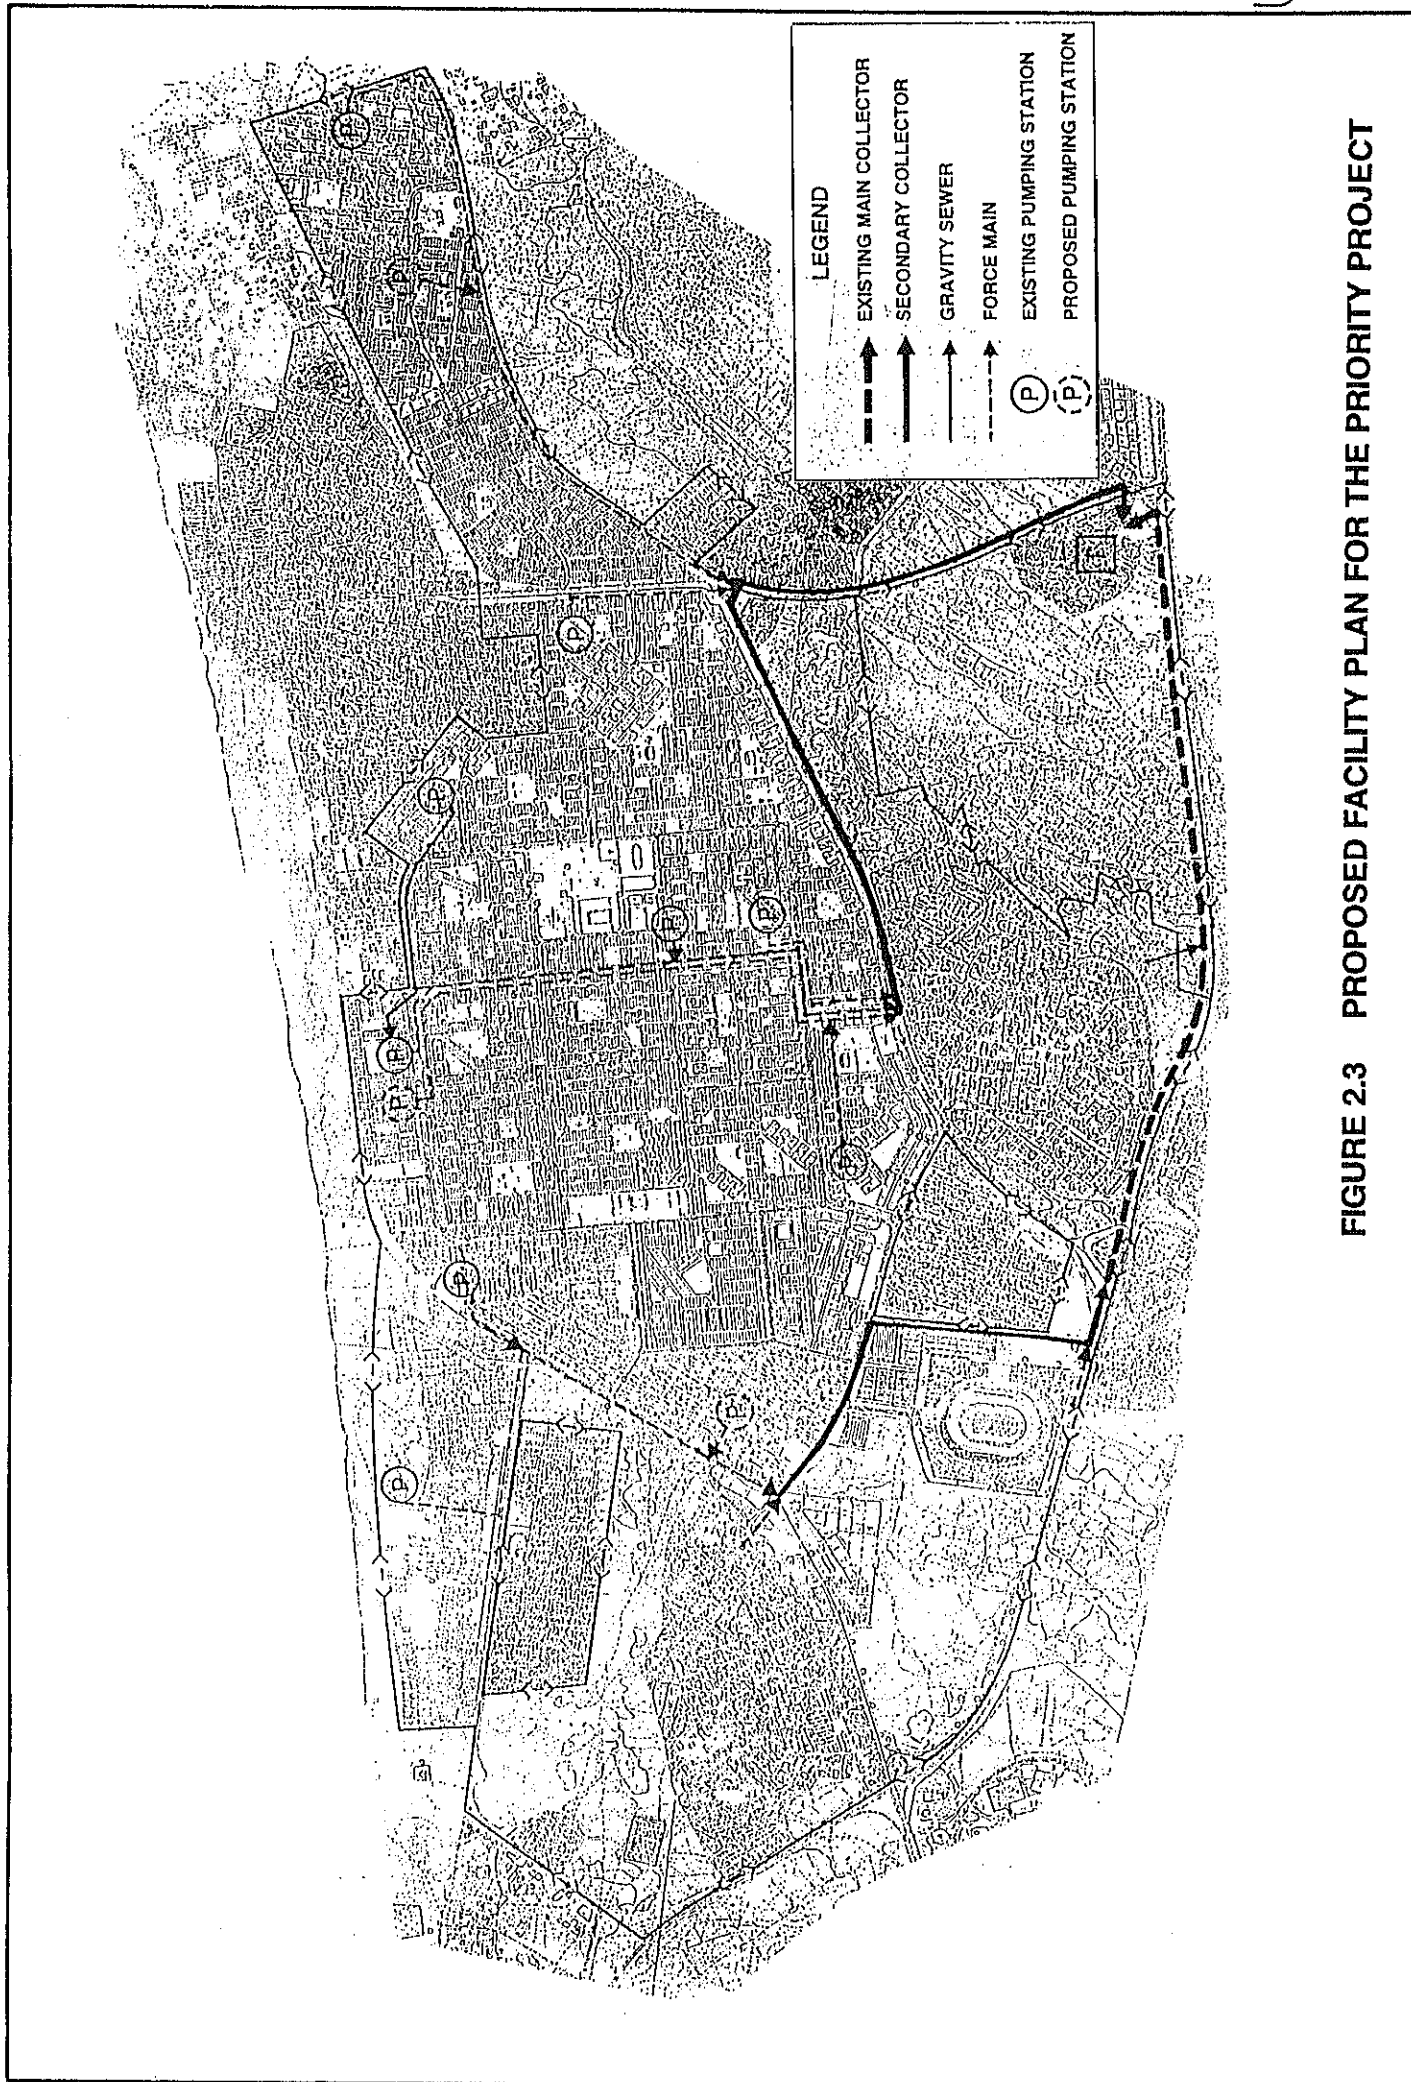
PROPOSED FACILITY PLAN FOR THE PRIORITY PROJECT
